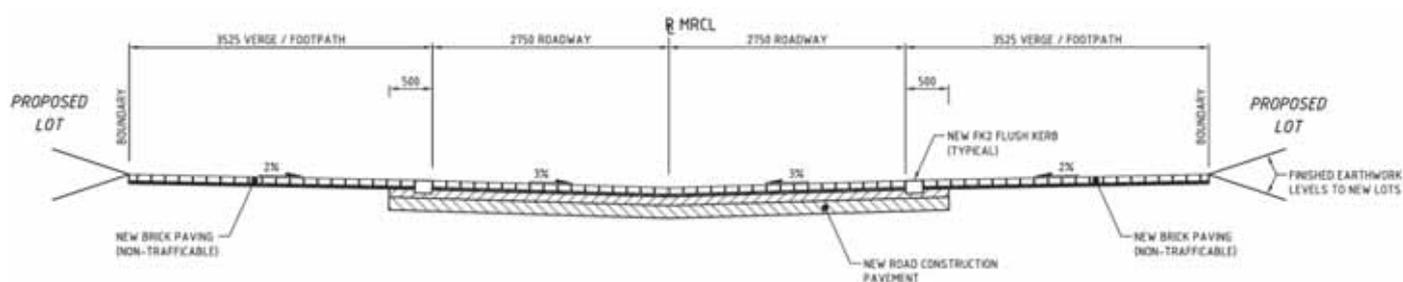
TYPICAL 'VEE DRAINED' CROSS-SECTION
